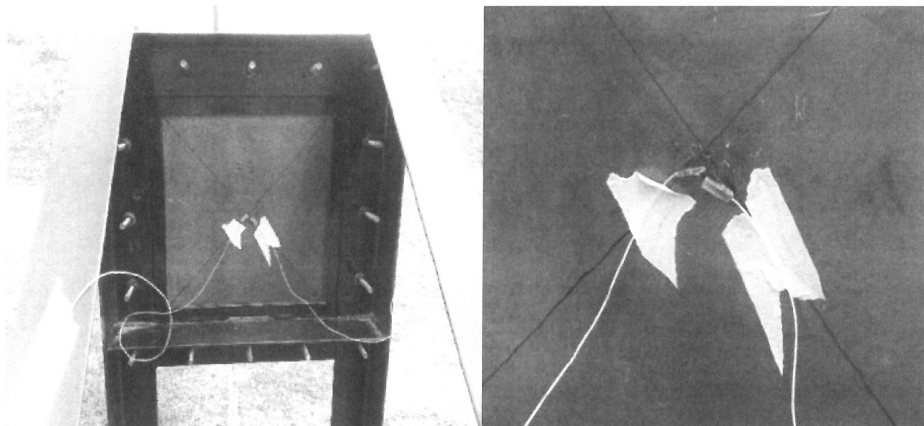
Detailed view of strain sensor at the back of steel plate before and after explosion test
